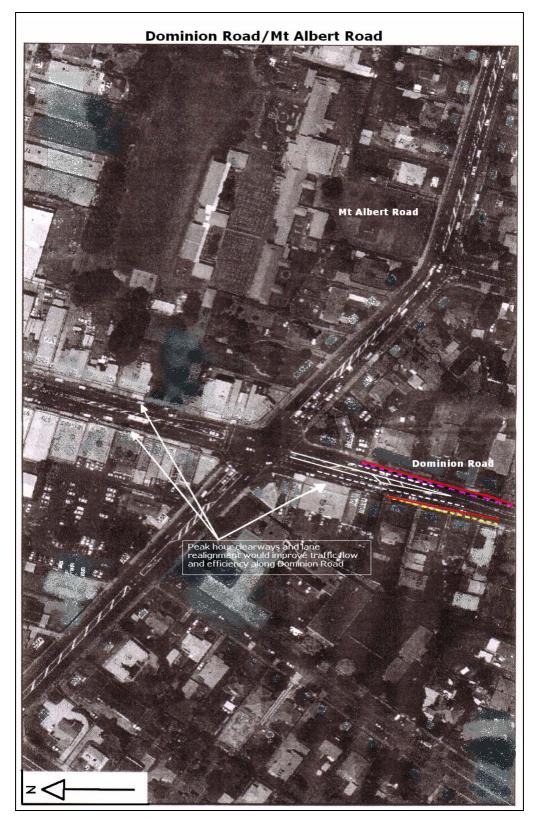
Feasibility plan of the Dominion Road/Mt Albert Road intersection (not to scale).
